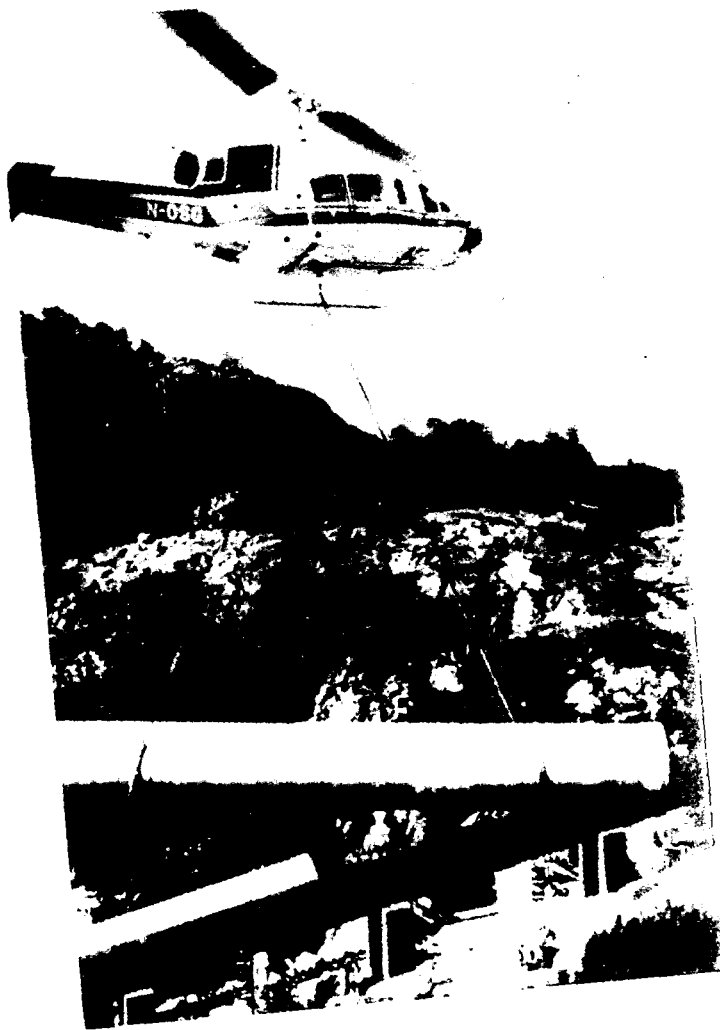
Installation of penstock pipe for hydroelectric power station, 1600 mm diam., 10 bar operating pressure, in Norway.
